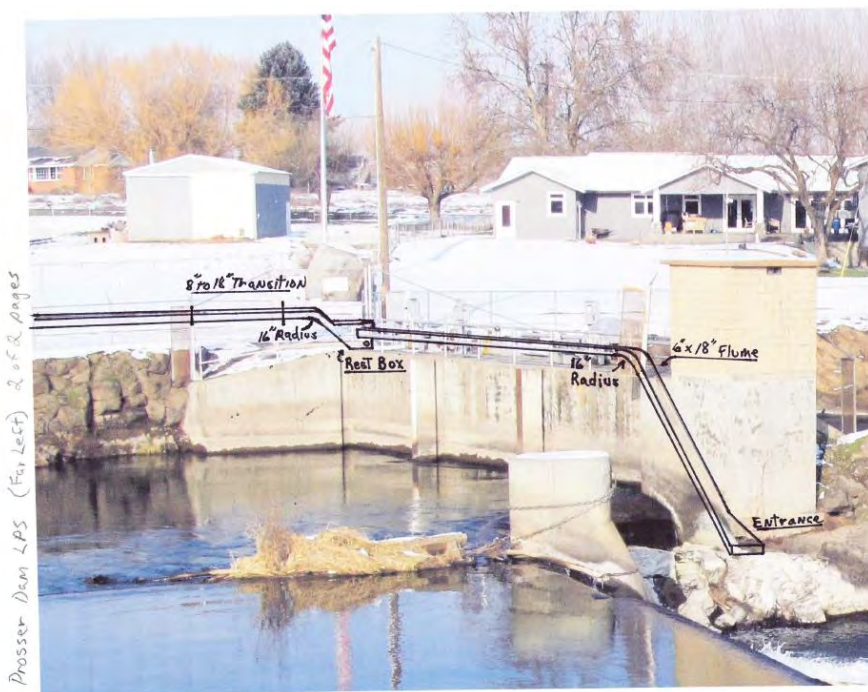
A photo with an engineer drawing depicting the proposed route on the far left LPS site at Prosser Dam (the downstream half). The specific route and dimensions can certainly be modified, but it provides one example of what the LPS would look like.
